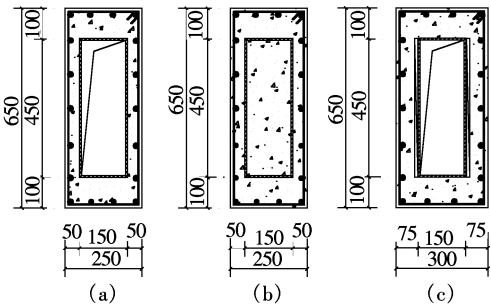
Details of specimens. (a) KL1, KL3 and KL6; (b) KL4 and KL5; (c) KL2 and KL7
